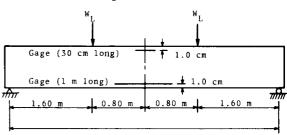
Beam 5 (bonded prestressed, straight pretensioned and nonprestressed steel, under two-cycle, short-time loading)
